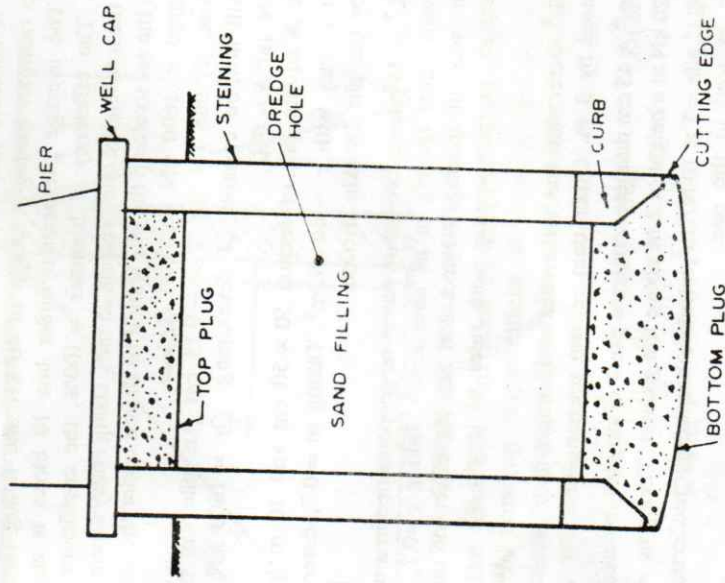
SECTION OF A WELL FOUNDATION.
